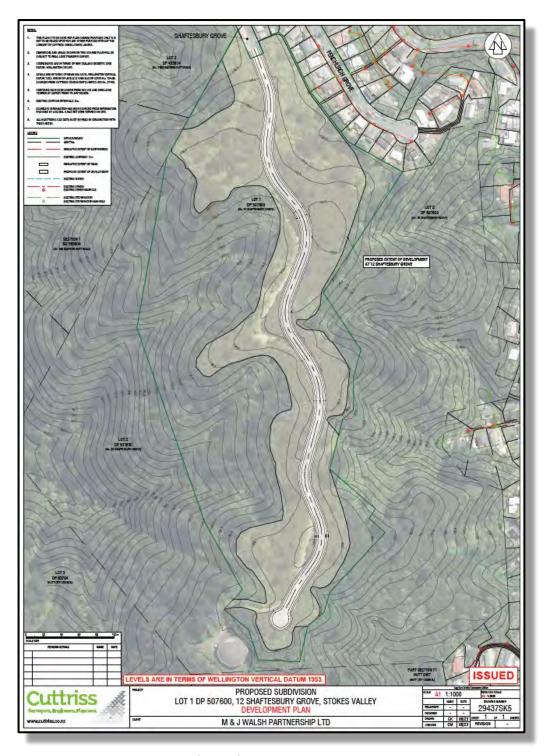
Concept Lot Layout Plan. (Cuttriss)
